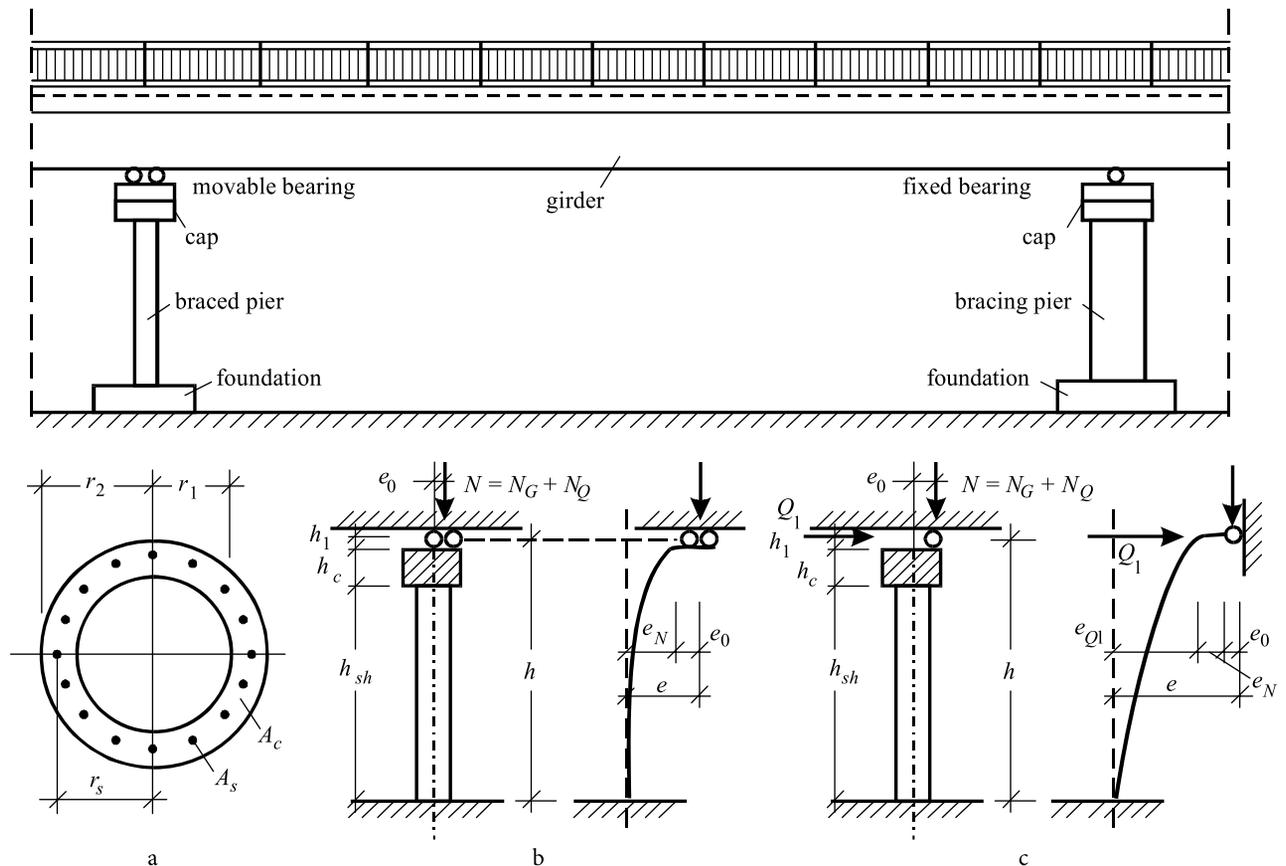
Modelling of cross-sections (a) and eccentricities for spun concrete shafts of braced (b) and bracing (c) piers
